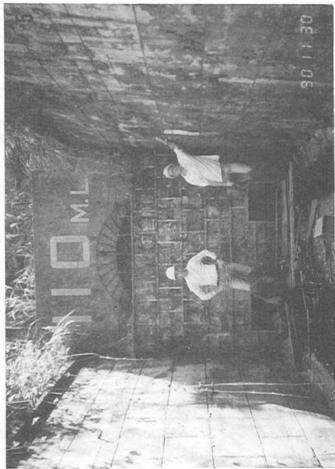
Flooding in the 110 m level main haulage drive caused by a roof collapse
